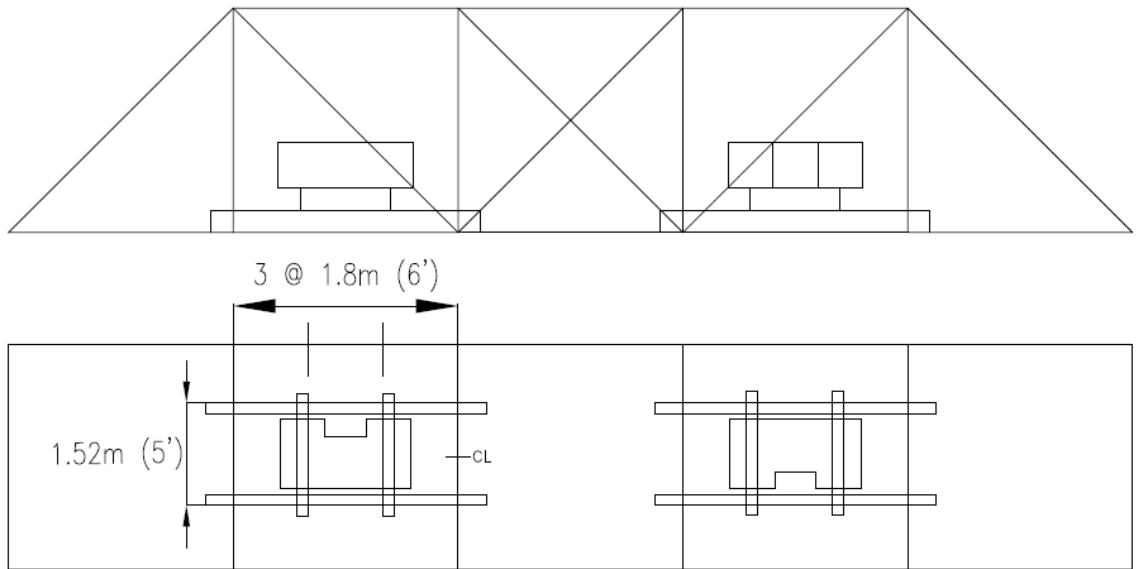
Dead Load Configuration, Elevation and Plan View, Rock Creek Bridge
